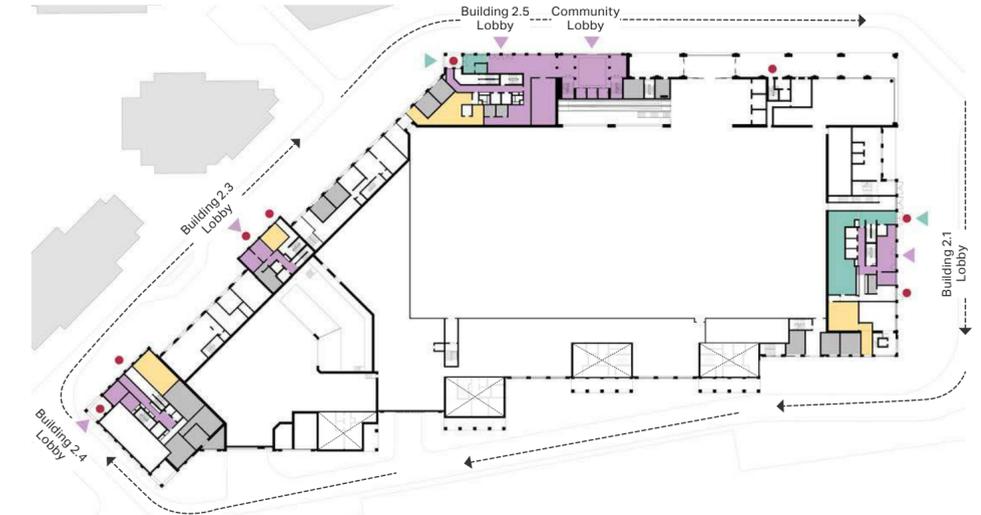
Plot 2 - Ground floor access, entrances, servicing, refuse and cycles
